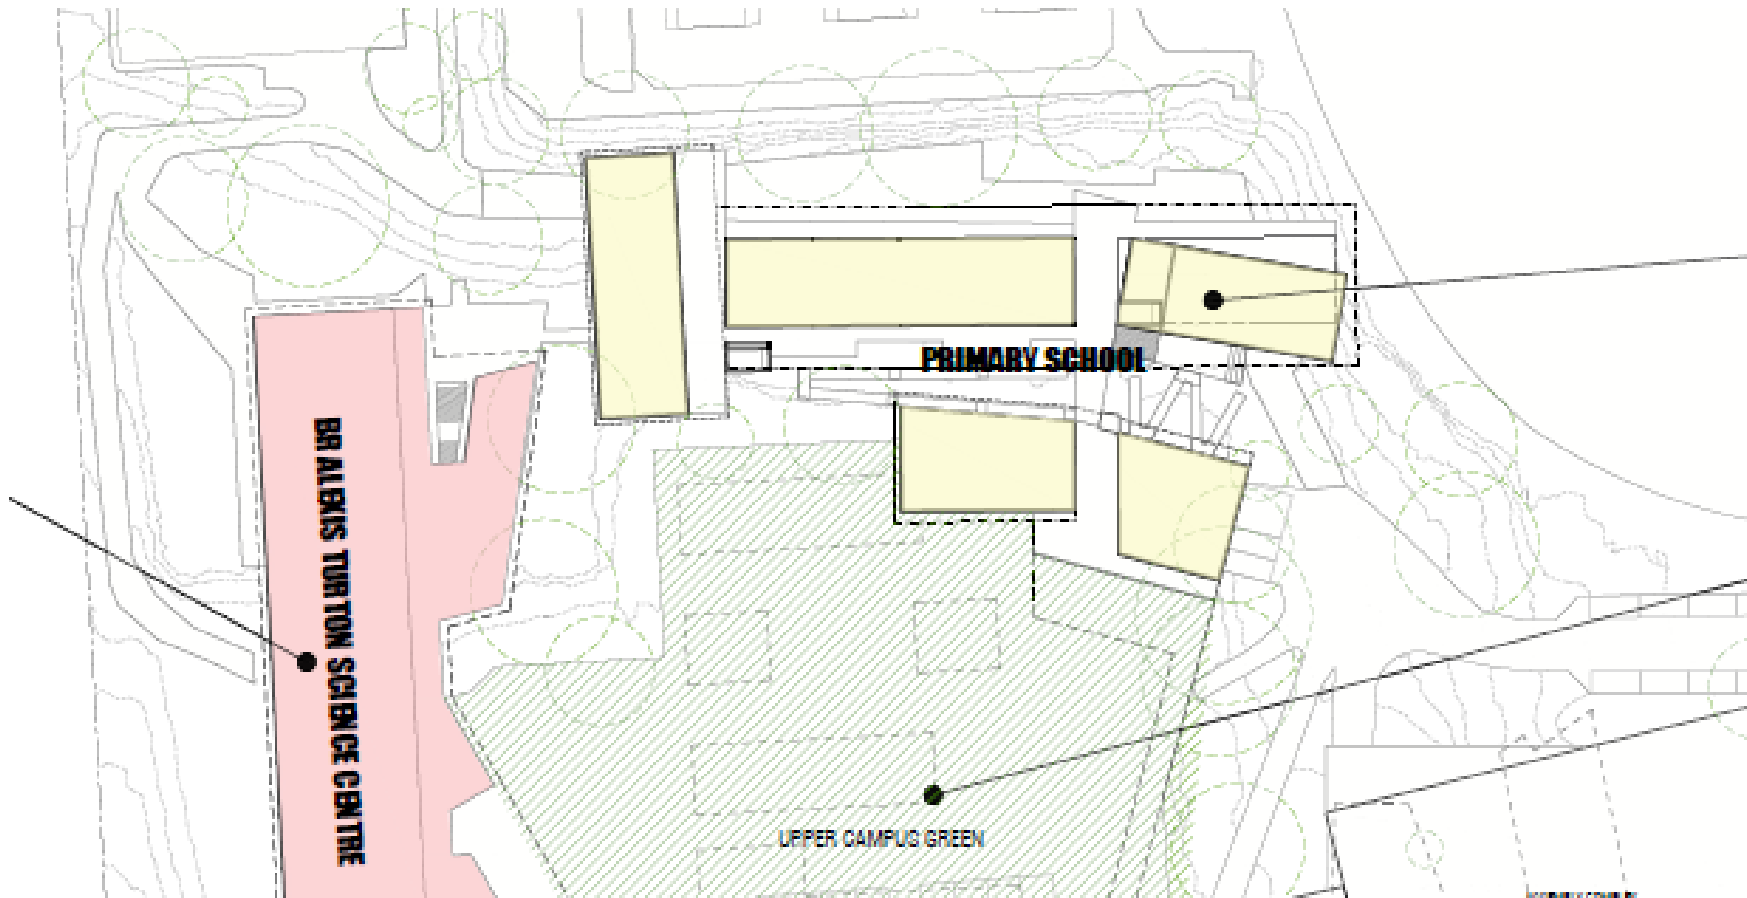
Extract from Site Pan where proposed Primary School location is being proposed
